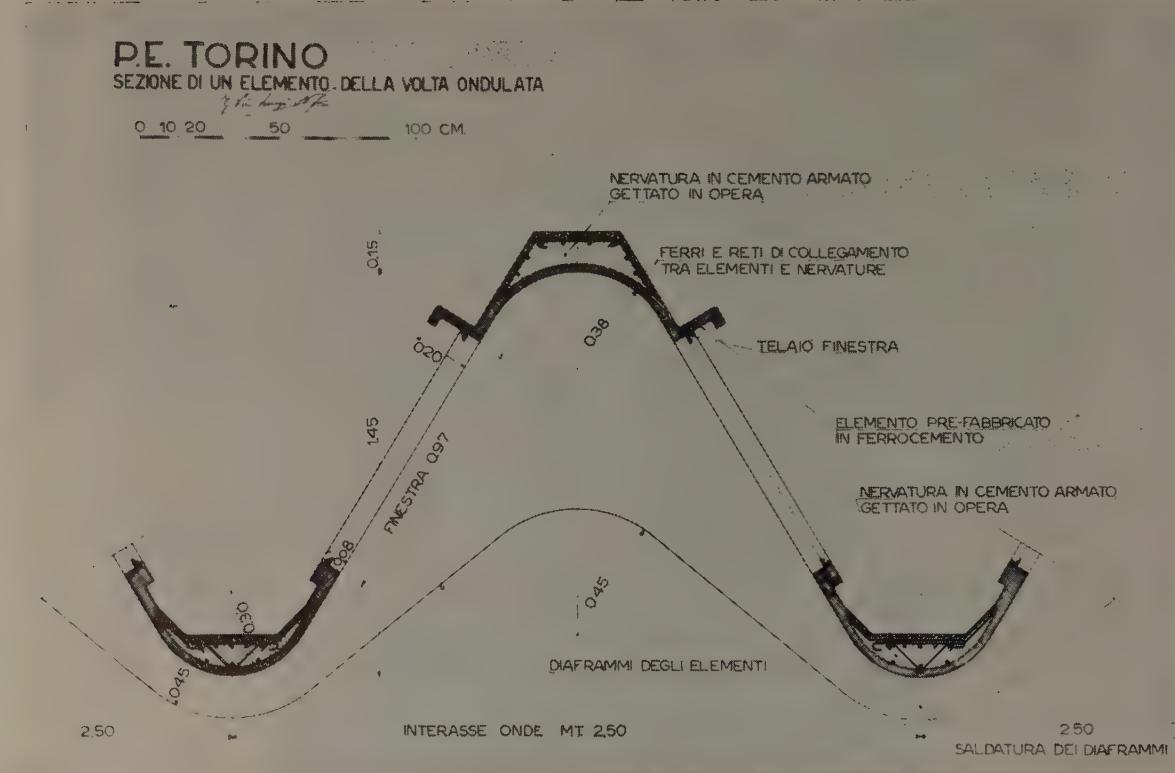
Exhibition Halls, Turin. Section of one of the Concrete Elements used in the Construction
